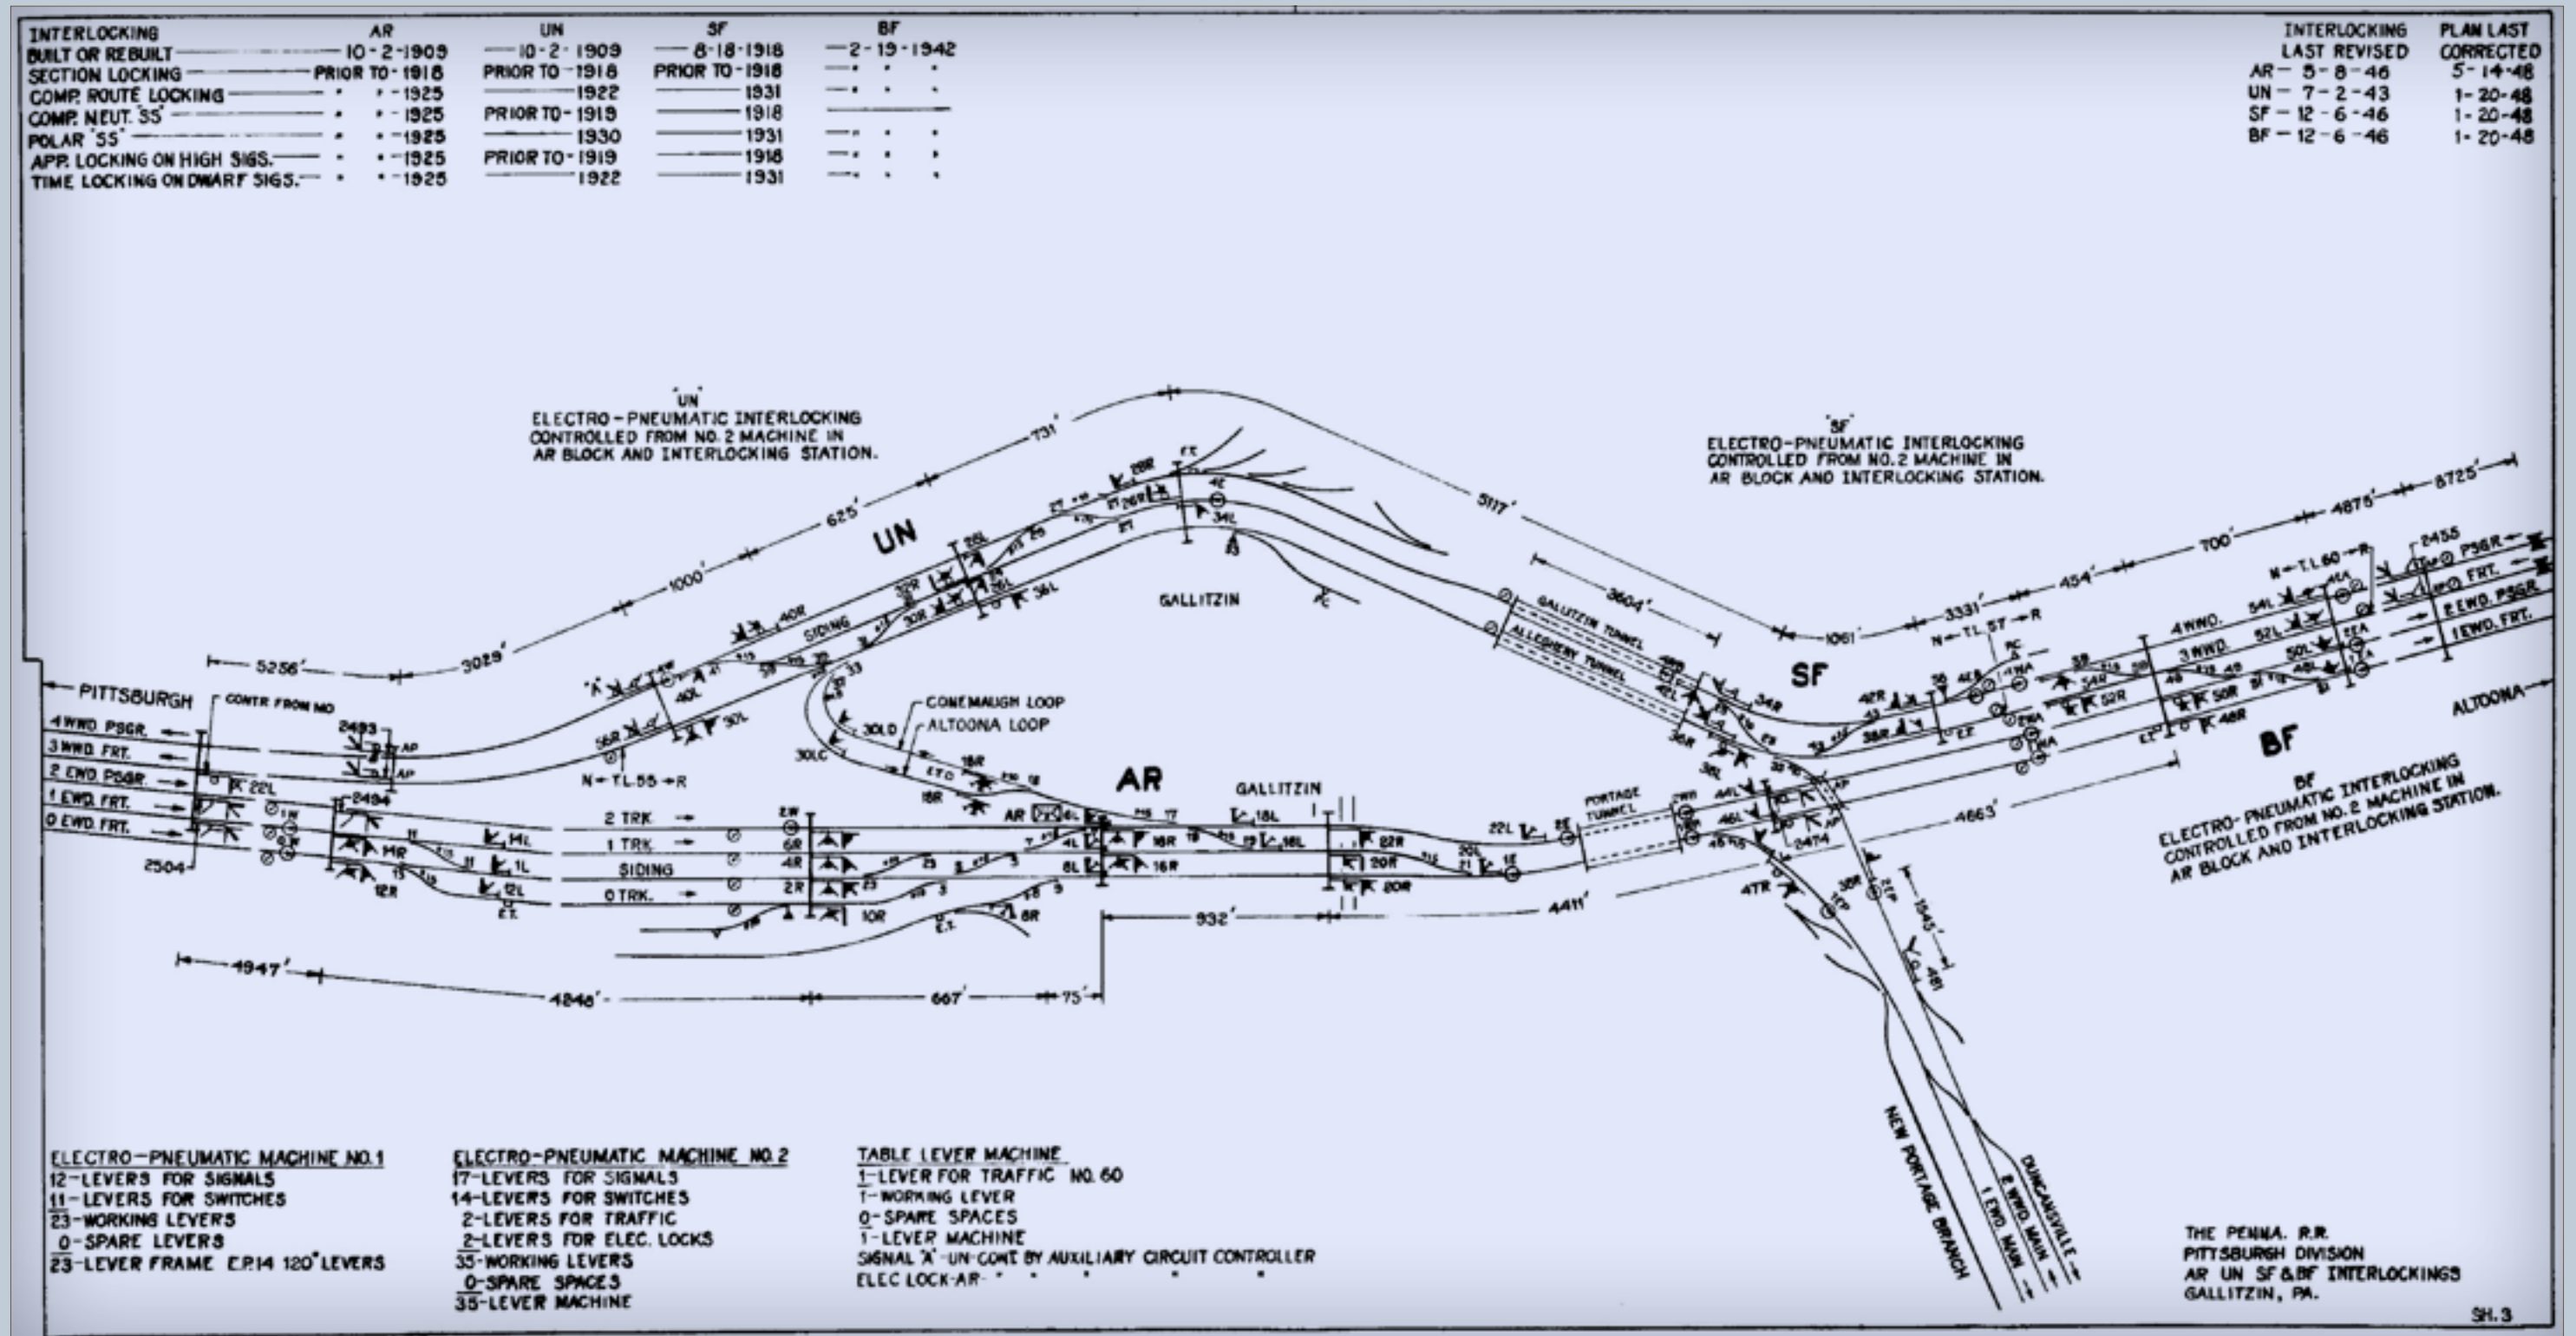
PRR Track Arrangement at Gallitzin, PA—ca. 1945.
